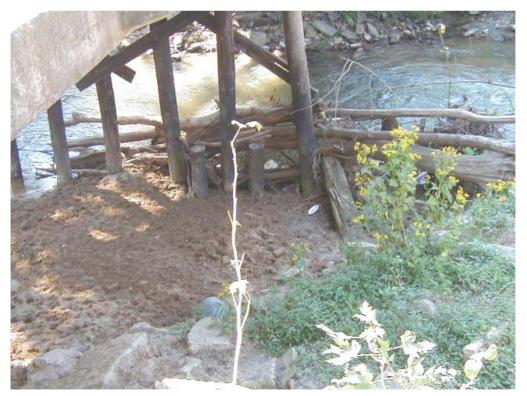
Lower Creek at Rocky Road bridge, facing upstream
